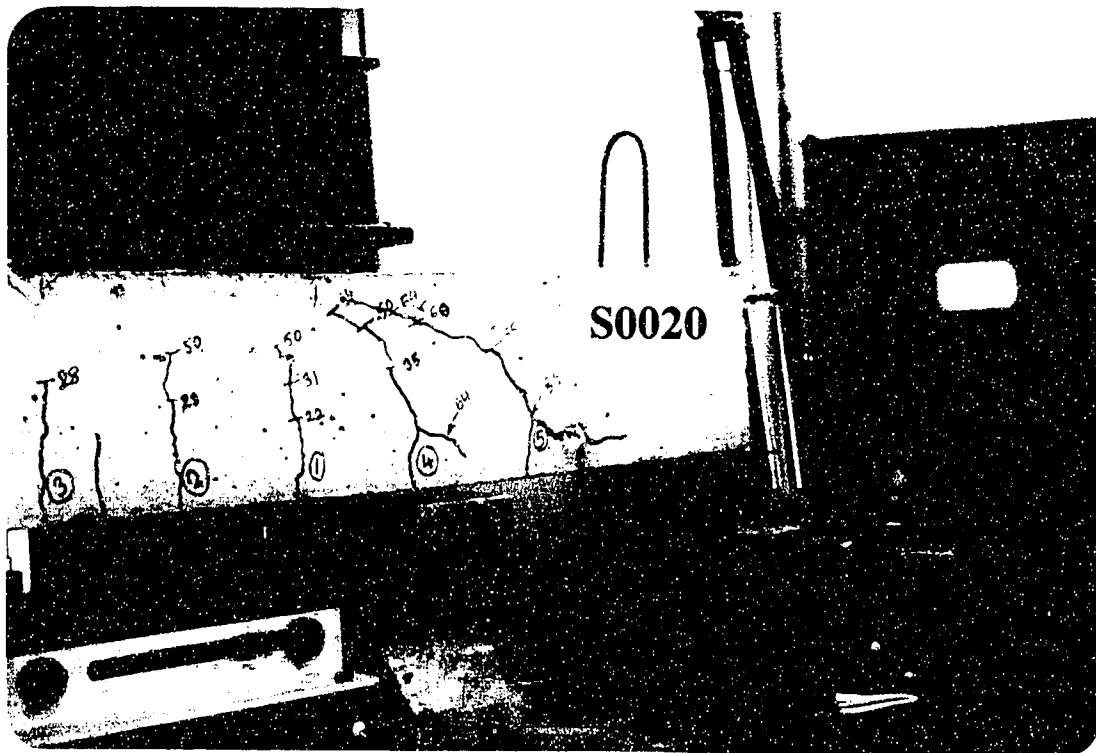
Photograph showing the mode of failure for control beam with shear stirrups at 200 mm c/c (S0020)
